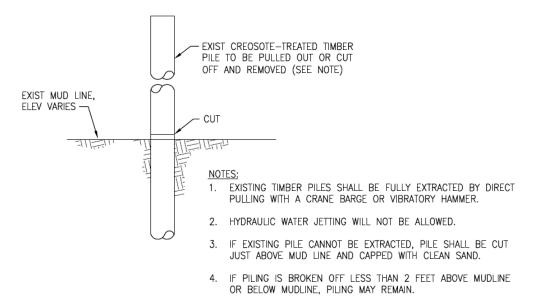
Typical Pile Removal Detail (from Sheet C304 of August 2020 Plan Set by Reid Middleton)
